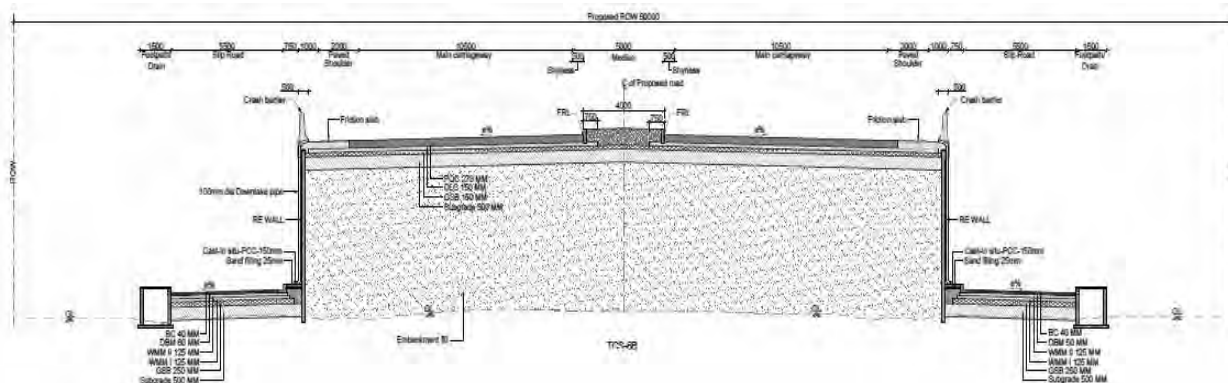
TCS-6B Typical Four Lane Underpass Cross Section with Slip Roads In Bypass & Realignment
